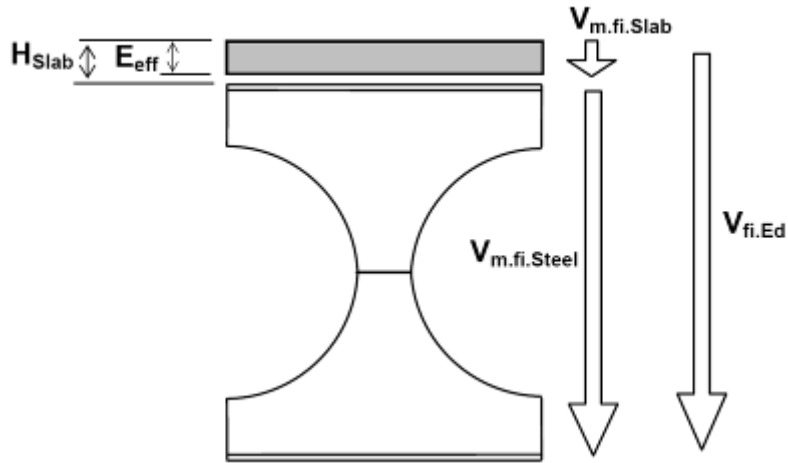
Shear force distribution between concrete slab and steel beam
